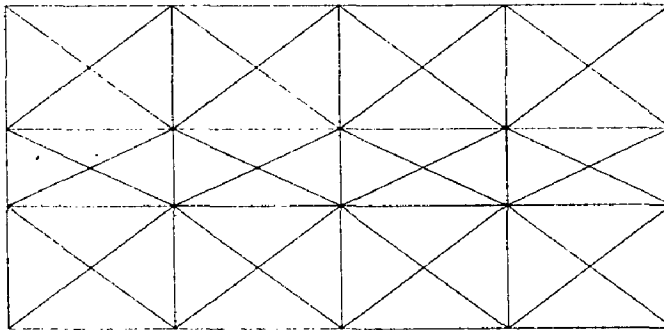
Dummy truss members to model floor as a rigid floor diaphragm
